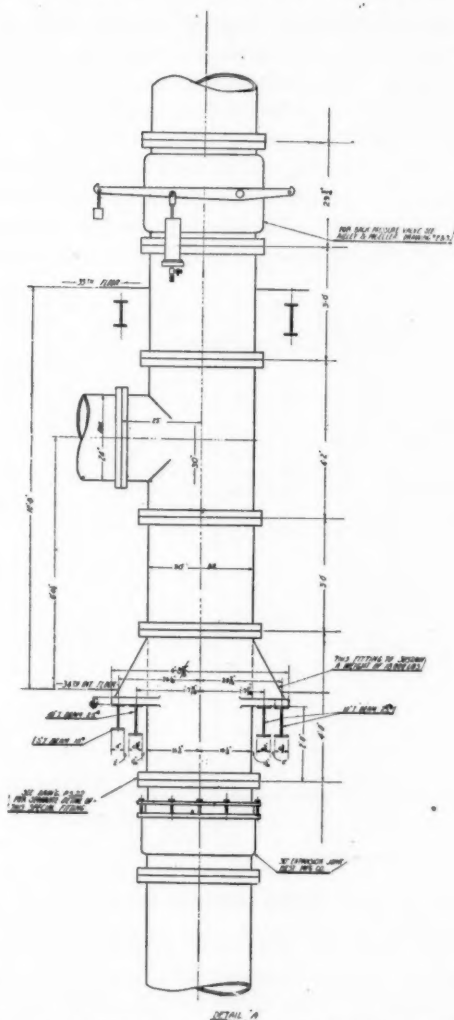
DETAILS OF EXHAUST MAIN CONNECTION TO HEATING SYSTEM.
